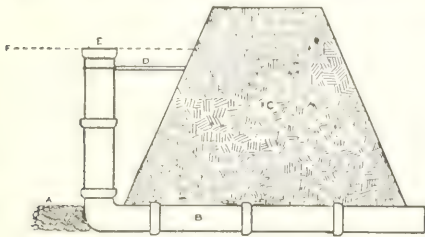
Outlet for pond. A, bottom of pond; B, sewer pipe; C, dike; D, standpipe support; E, standpipe; F, water surface
